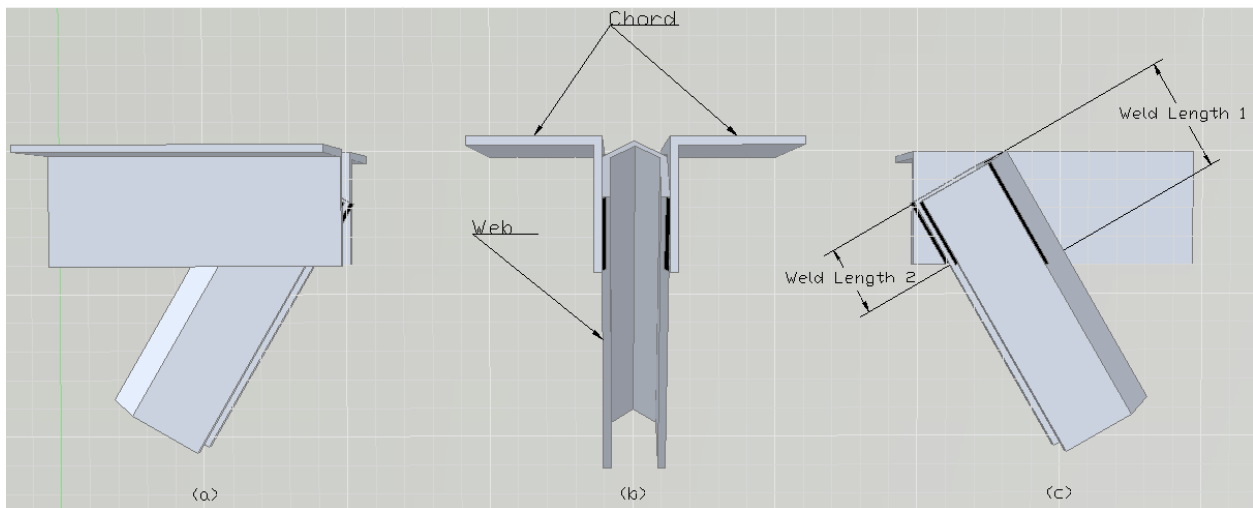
Crimped single angle web connection to chord, a) side view, b) view looking down chord, c) weld position
